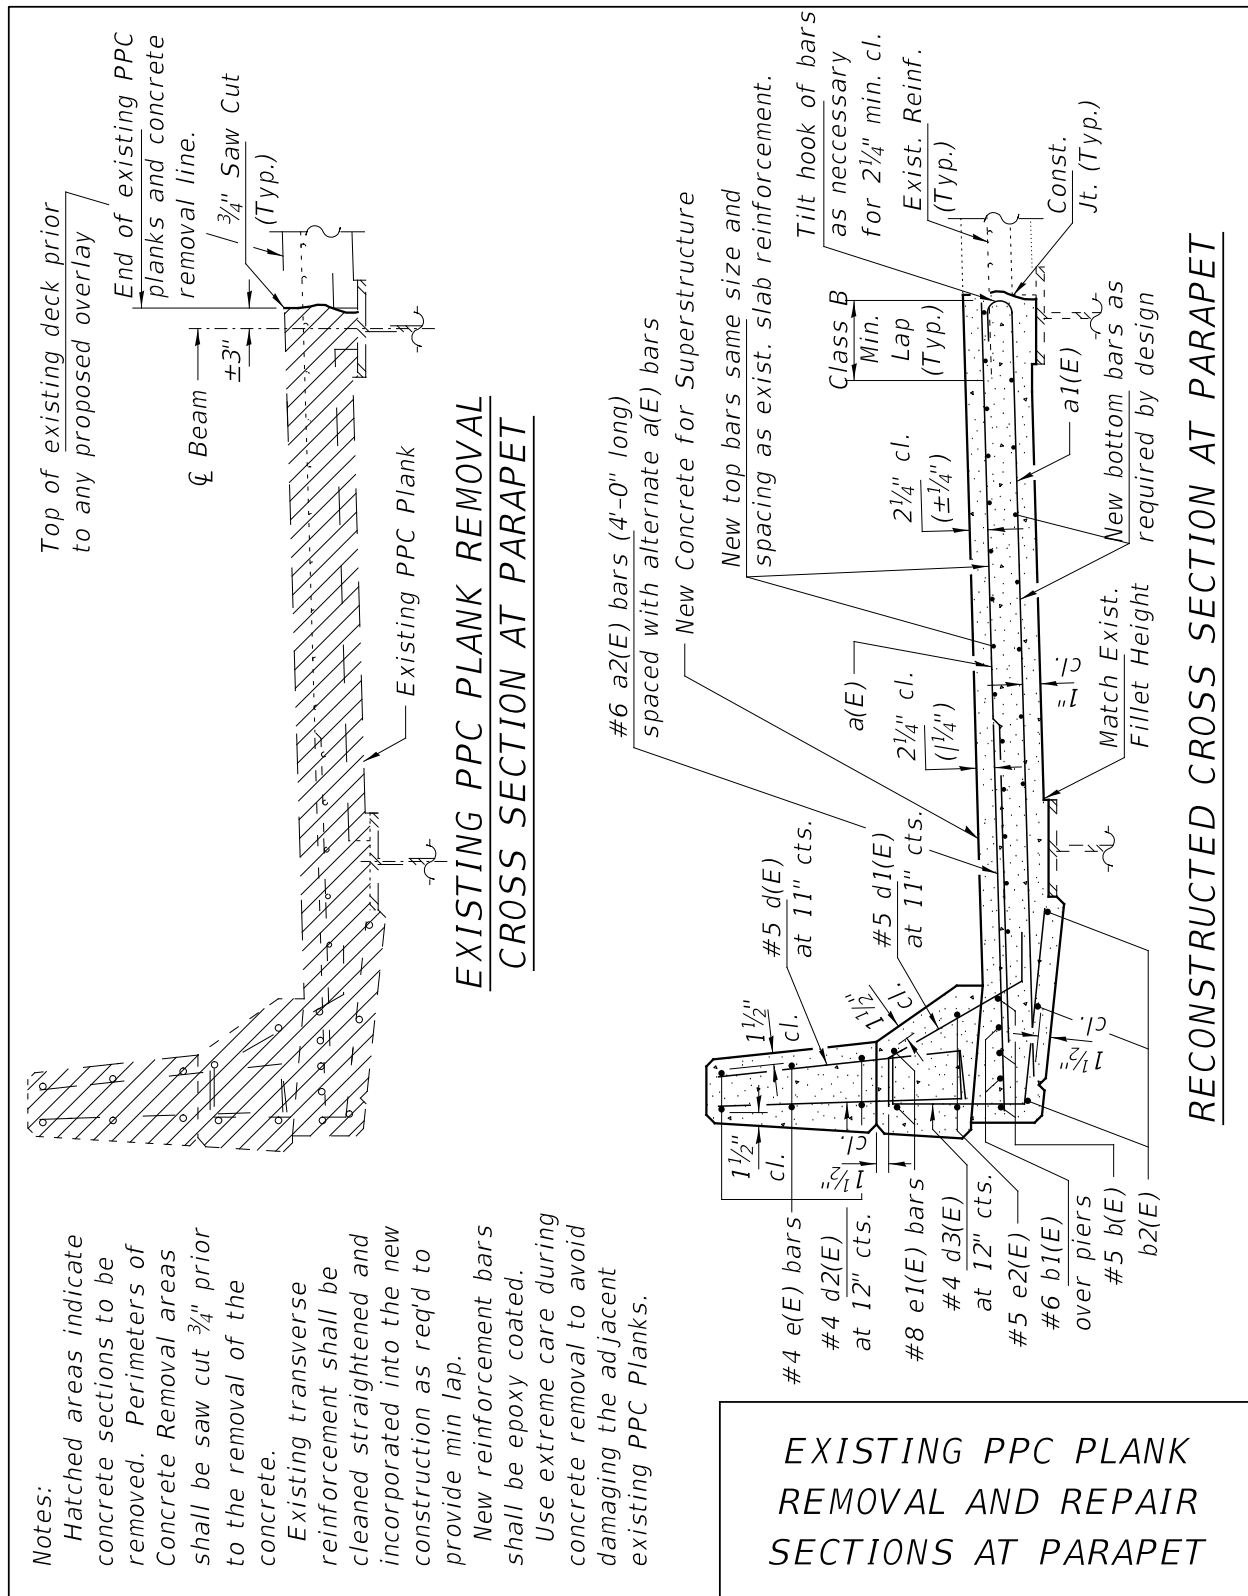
Existing PPC Plank Removal and Repair Sections at Parapet
